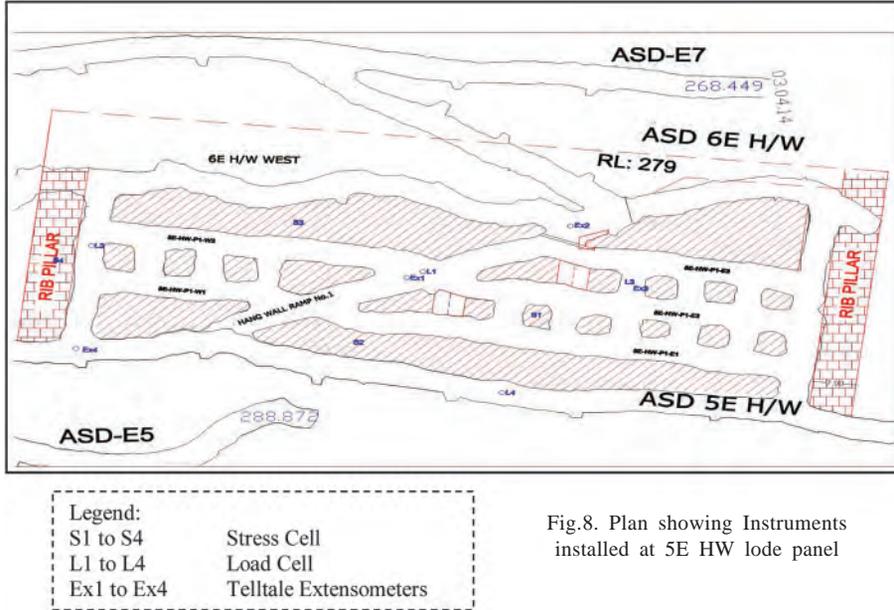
Plan showing Instruments installed at 5E HW lode panel
